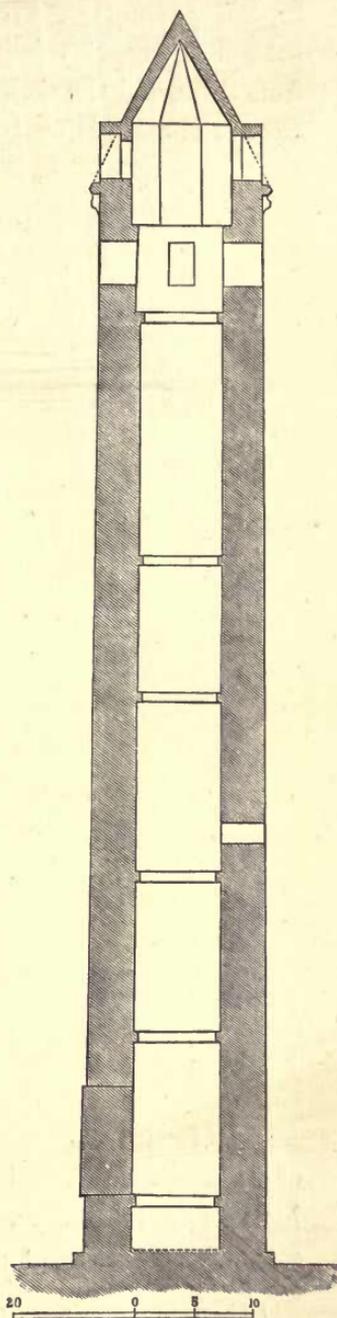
Section of Elevation of Round Tower of Brechin.
